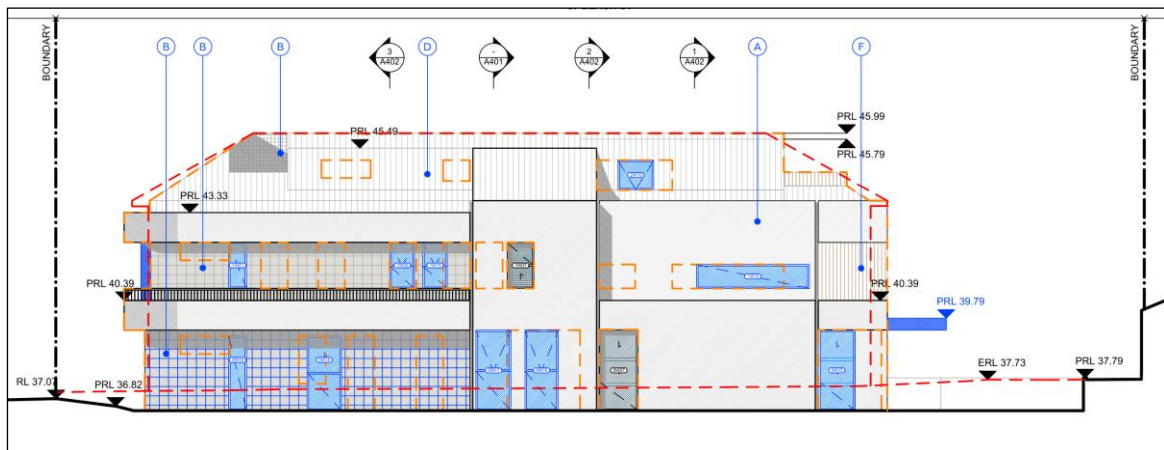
Proposed south elevation (source: Common Office, dated 5/11/2025)
